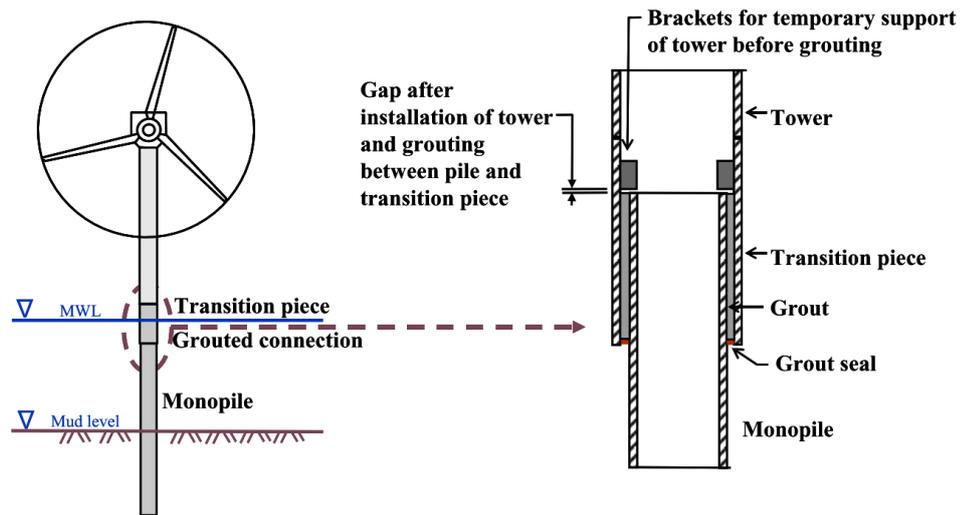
Grouted Connection in Monopile Structure [A.6]
